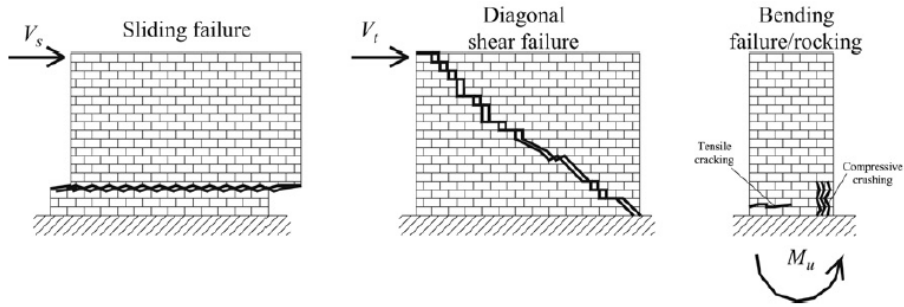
Various damage mechanisms considered for a masonry pier (source - [7])
